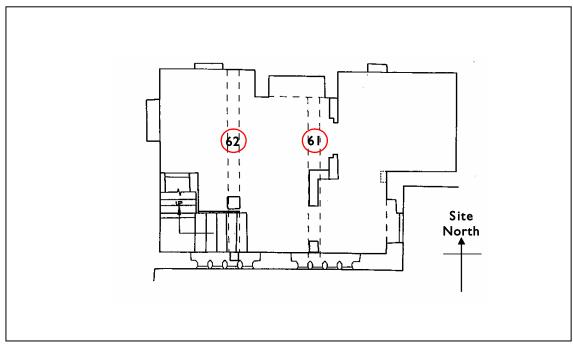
Plan of the basement to show sampled timbers (after Birmingham Archaeology)
